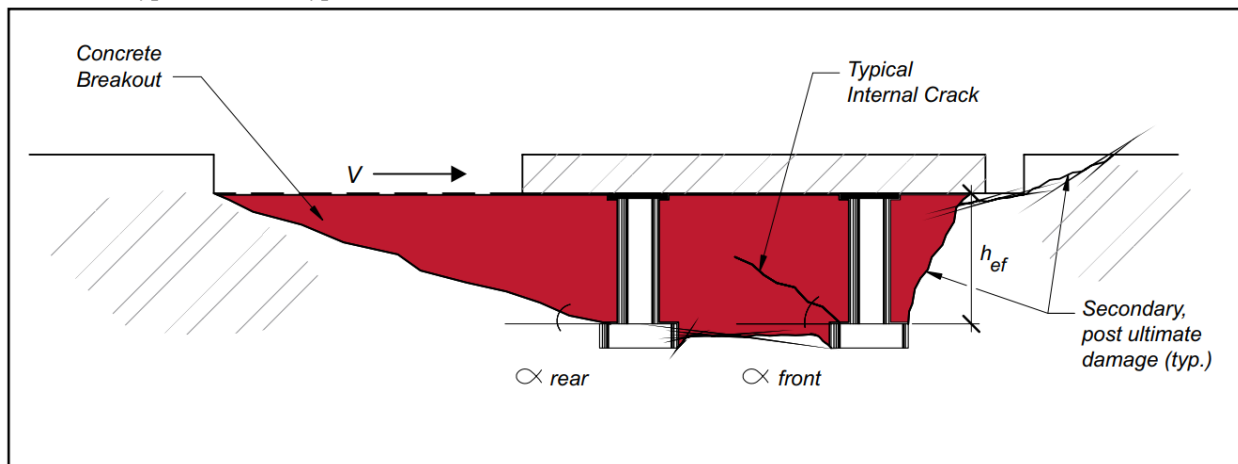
failure mechanism of concrete pryout failure due to shear (from Anderson and Meinheit (20))
